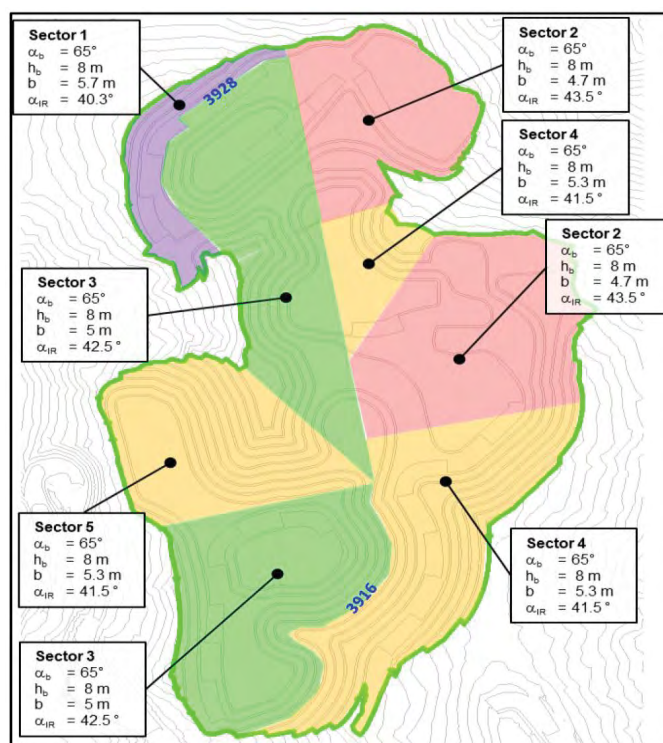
Geotechnical recommendations for Mirador (South Sector) open pit design
